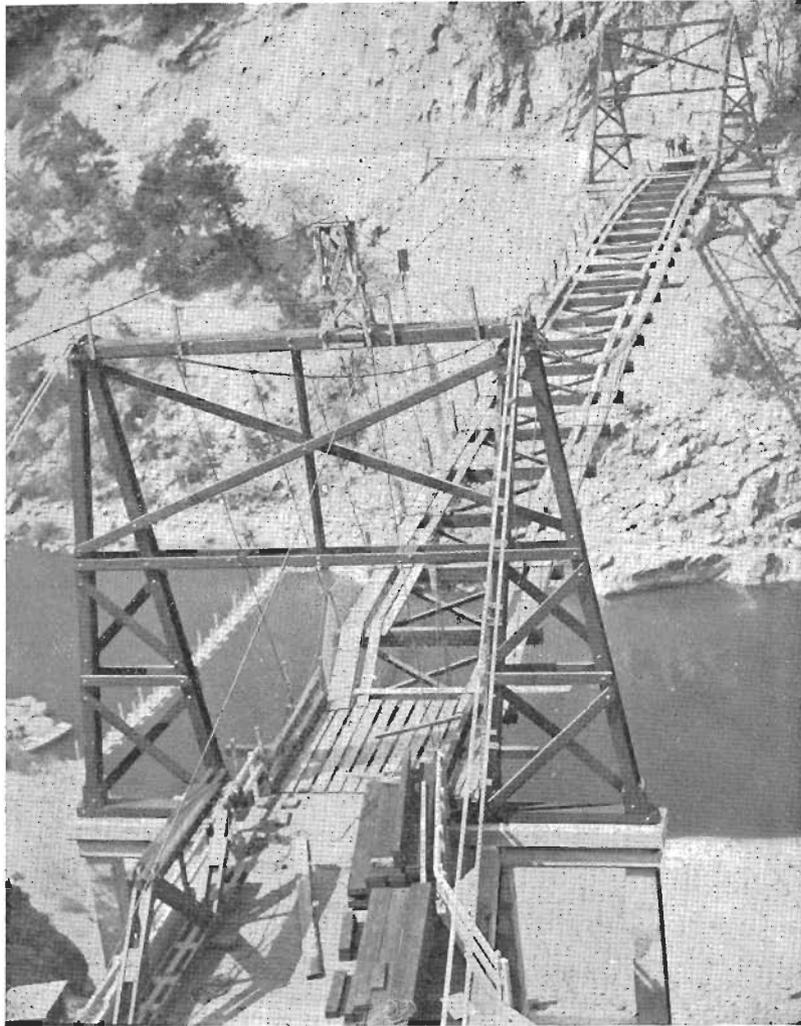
Vehicular suspension bridge. Bridge under construction before placing stringers.
